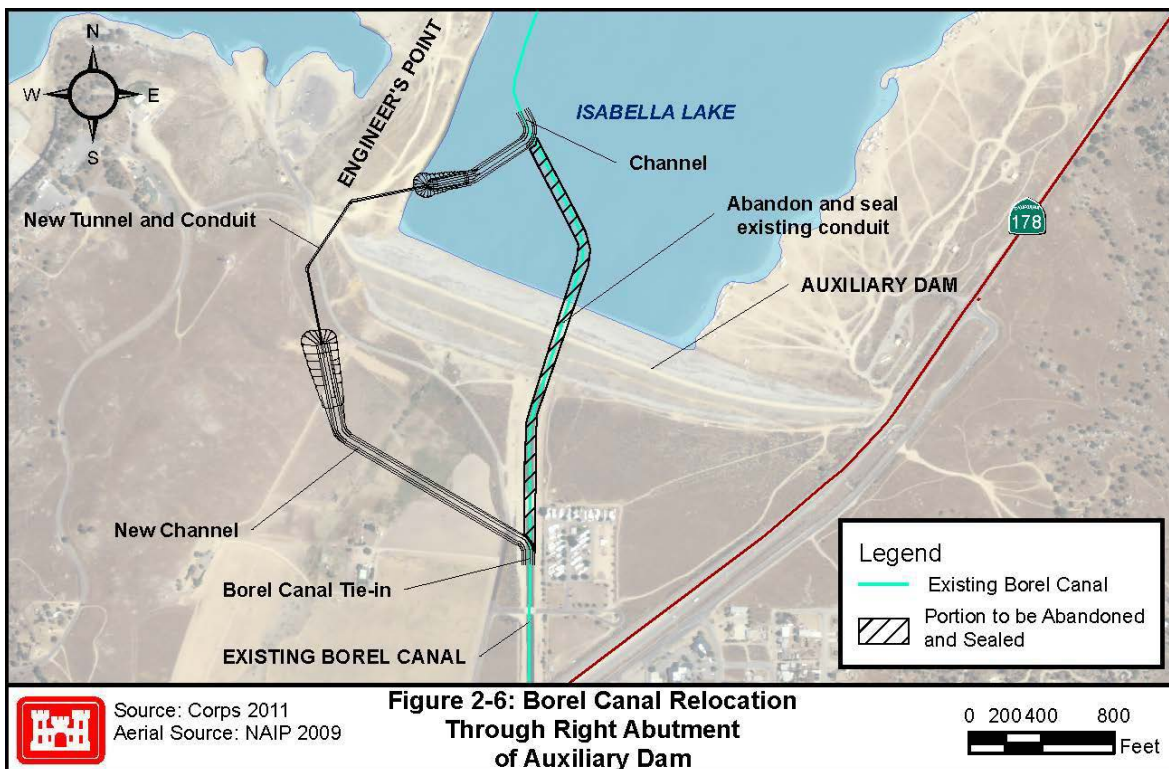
Proposed Bypass Conduit and New Channel, 2012 FEIS Alternative.
